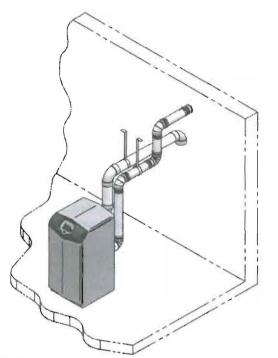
Stainless Steel Two-Pipe - See page 22 for more details
